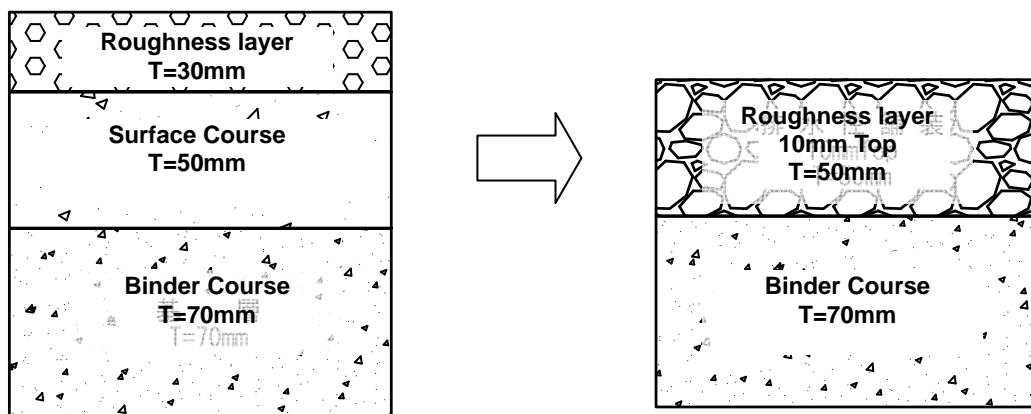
Decrease in Pavement thickness by Applying Permeable Pavement
